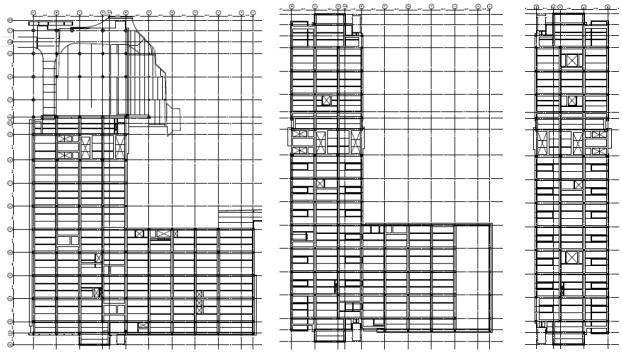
| Typical Building Floor Plans (Courtesy of Walter P. Moore)
